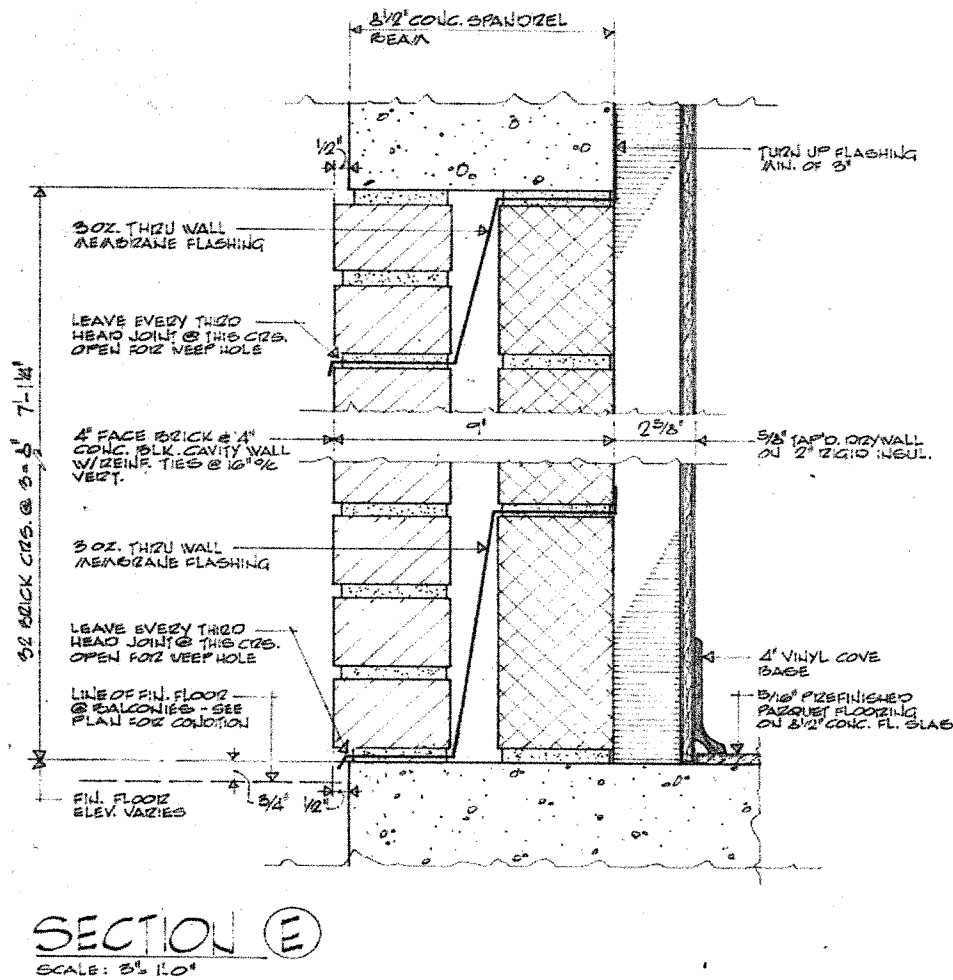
Typical wall section from original construction documents, prepared by Robert Charles Associates, Inc., dated December 11, 1967. Note locations of through wall flashings.
